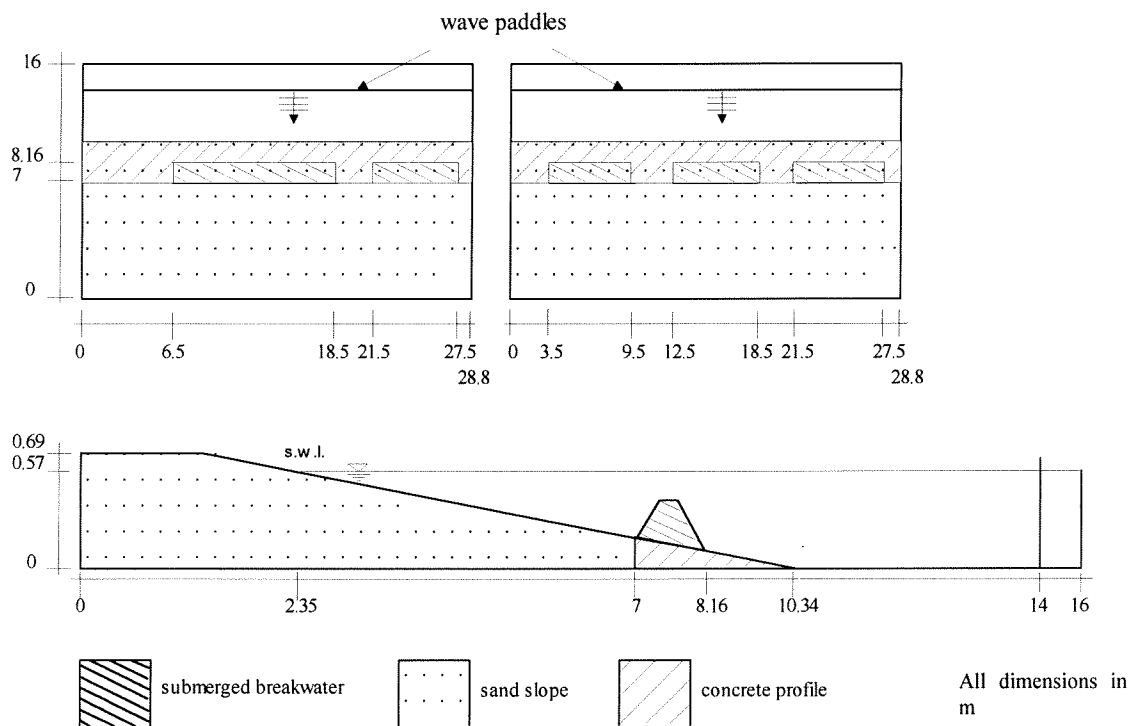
Plan view & Cross-section of the two configurations (Delft)
